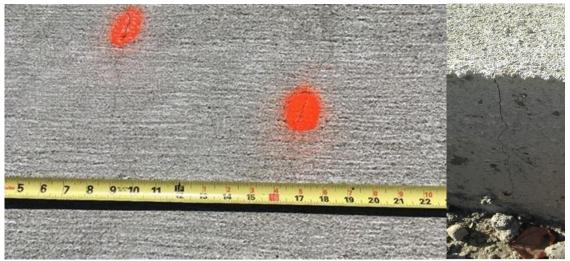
Crack Survey on US 60 CRCP Exposed Surface After 3 Weeks of Curing. CRCP = continuously reinforced concrete pavement.
